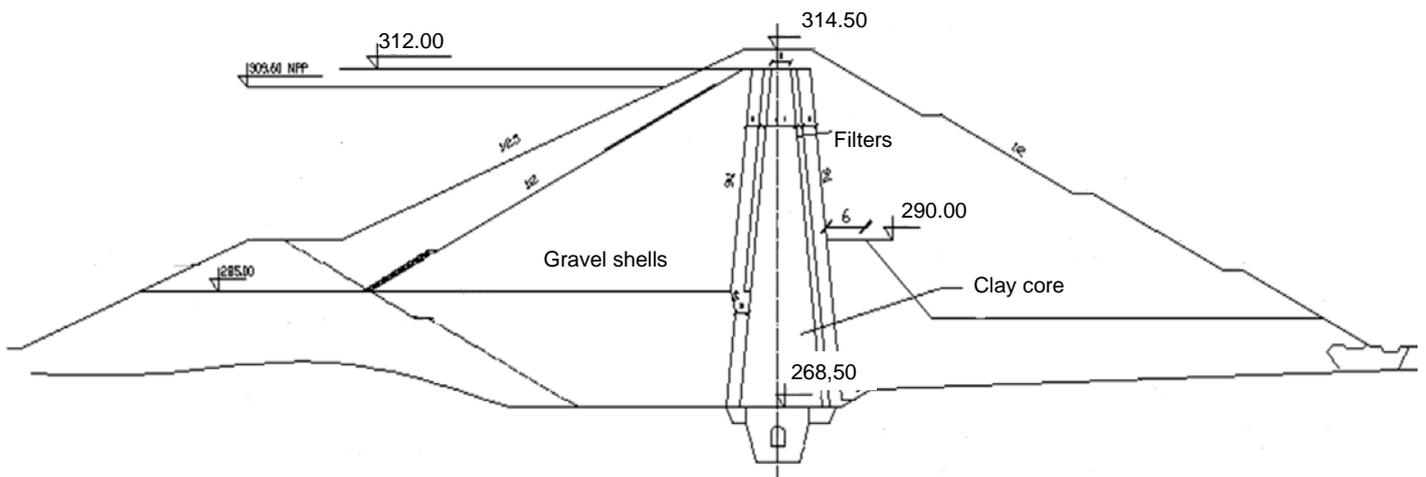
Typical cross-section of Świnna Poręba Dam.
